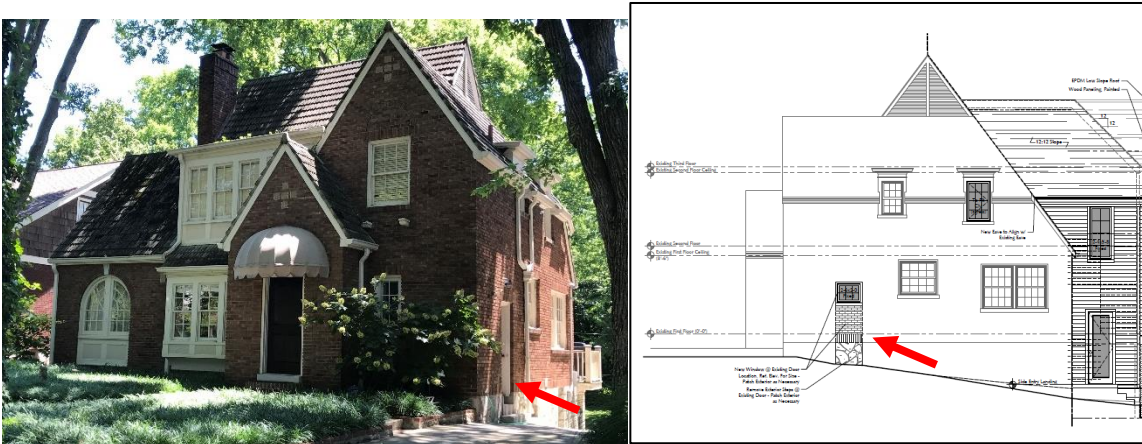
(Left) shows the existing door and Figure 5 (Right) shows the proposed window opening in its place.
